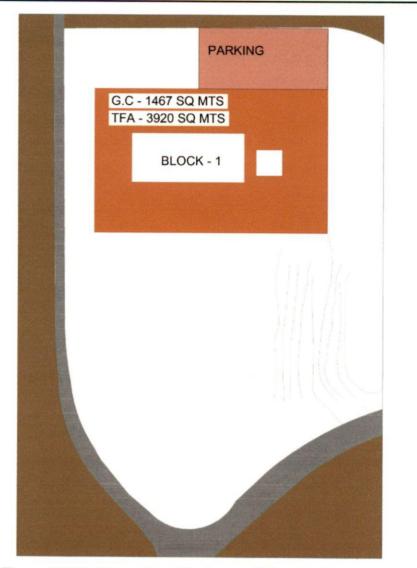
Site Plan of Architecture and Planning Department Source: Author
